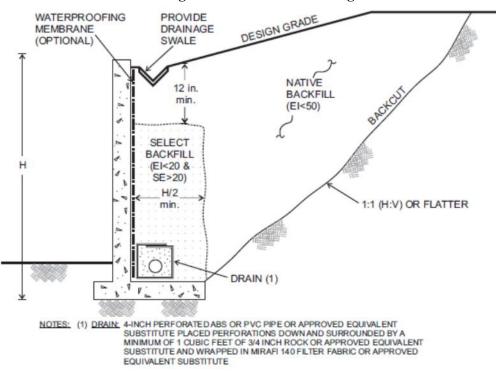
Retaining Wall Backfill and Drainage
